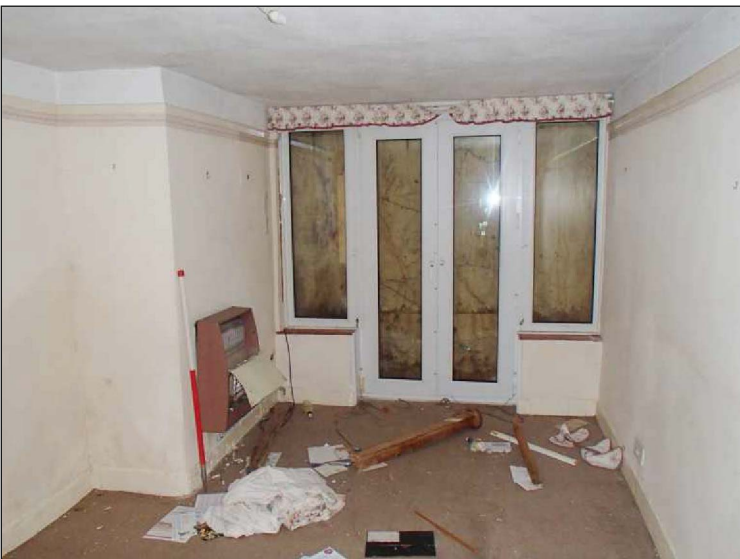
Room 4, view to modern French doors and possible chimney breast on east elevation, looking south-southwest. (1m scale)
